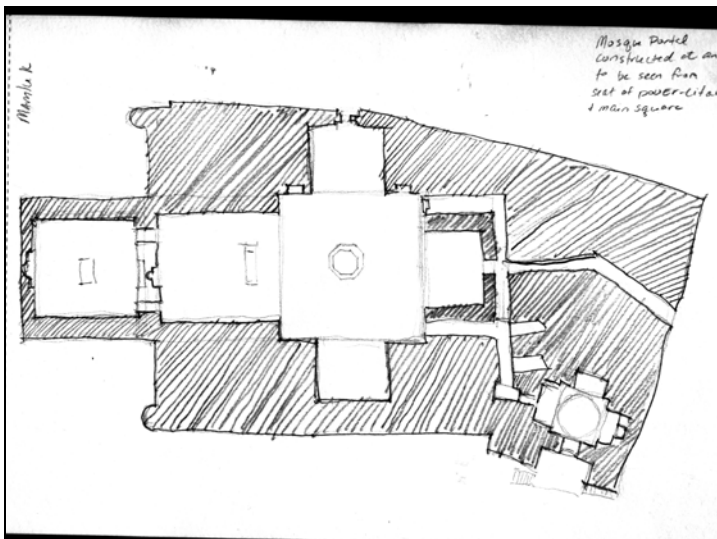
Plan of Sultan Hassan Madrasa, Cairo
